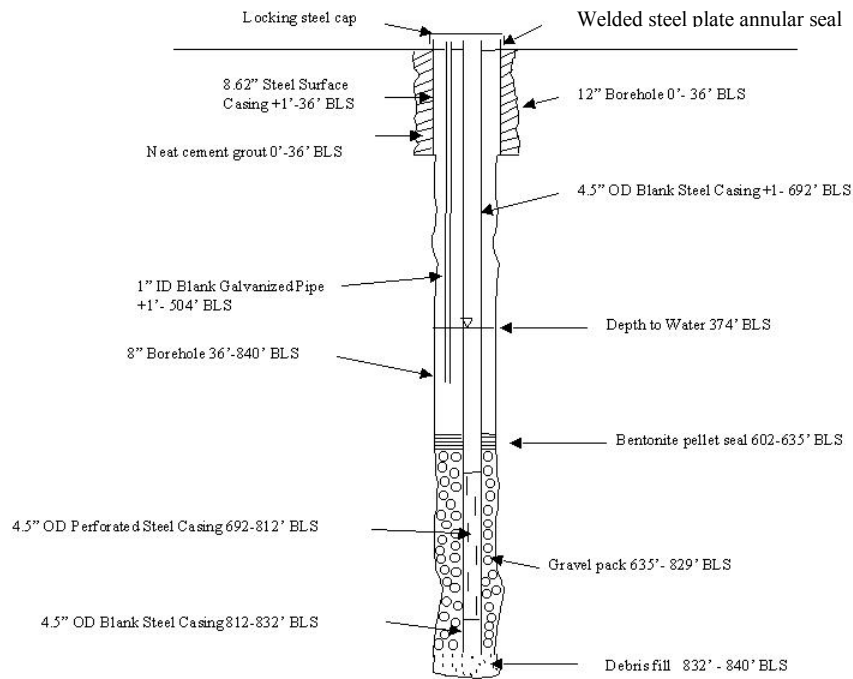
As-built well construction drawing for B(15-1) 08DAA
